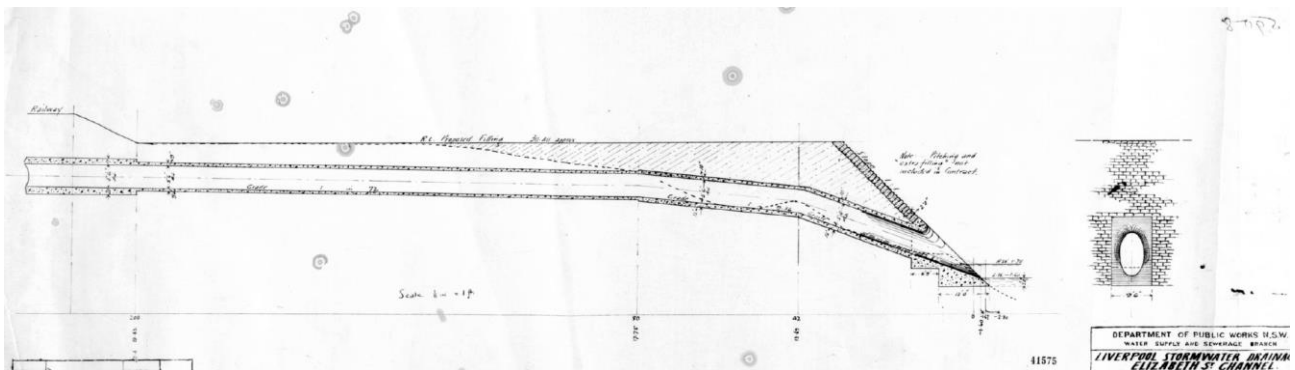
1920 plan of brick oviform drain at Elizabeth Street, Stormwater drainage channel (amended outlet details).
